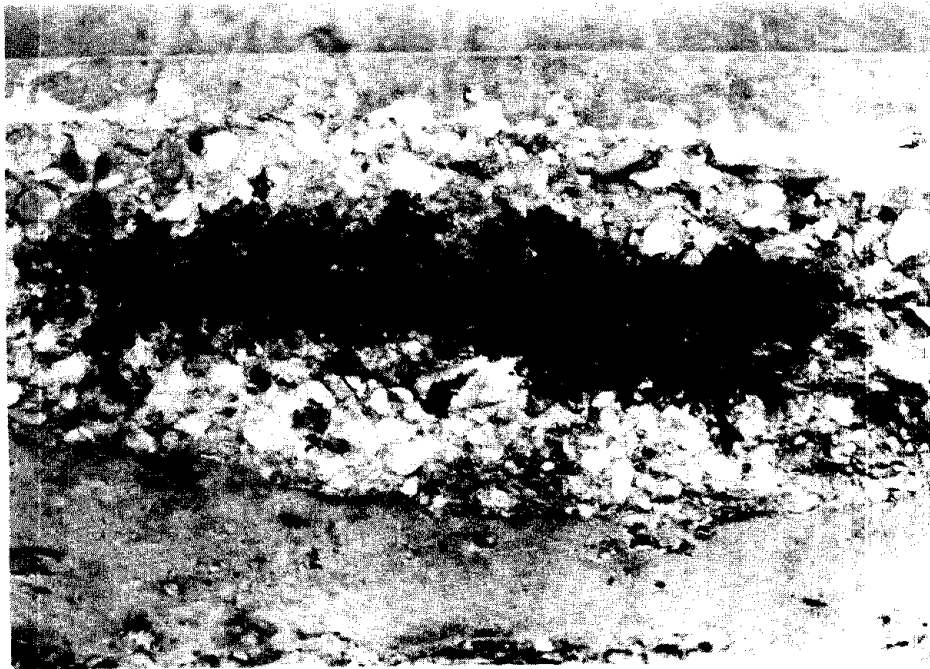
Severely corroded strand on the north side of Girder 3, Span 4.
